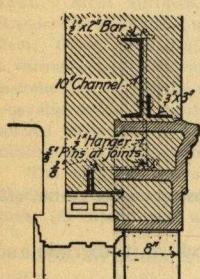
Section through plain soffit and molded lintel over window opening.
